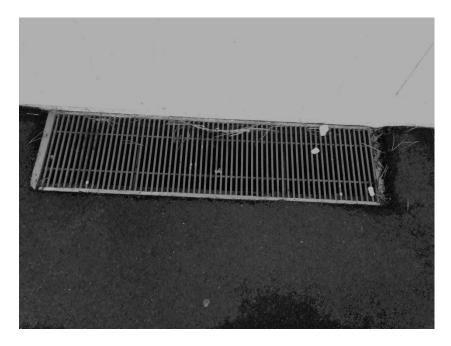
4 feet (length) by 1 foot (width) feet air vent
